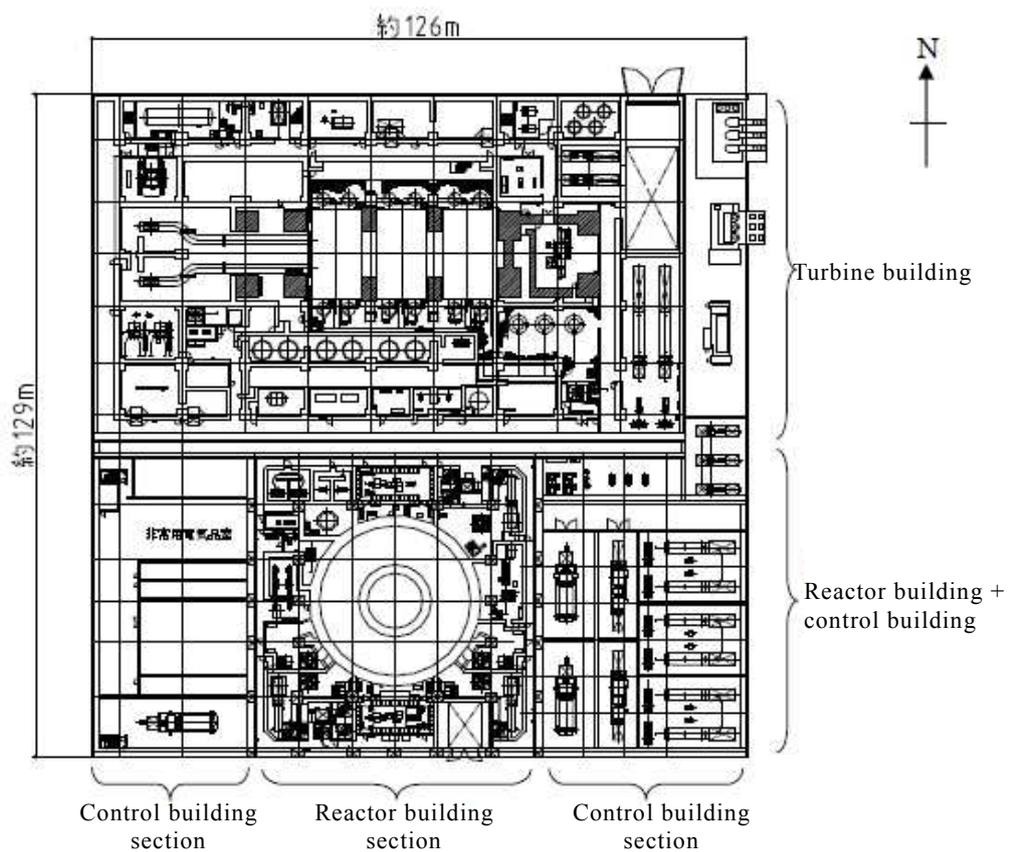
Overview of planar view of BWR common foundation type seismic isolation building
